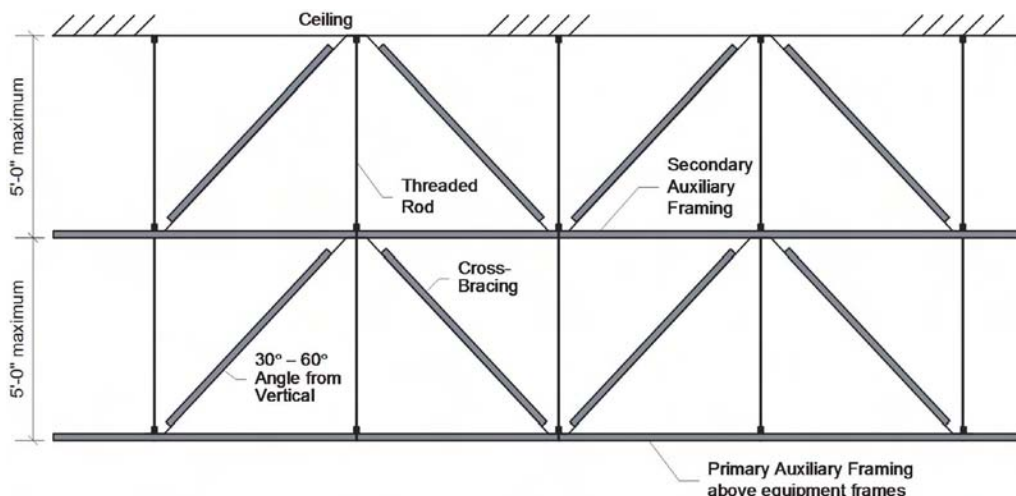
Elevation view: Truss arrangement for multilevel auxiliary framing (the type shown is called a Warren truss).
